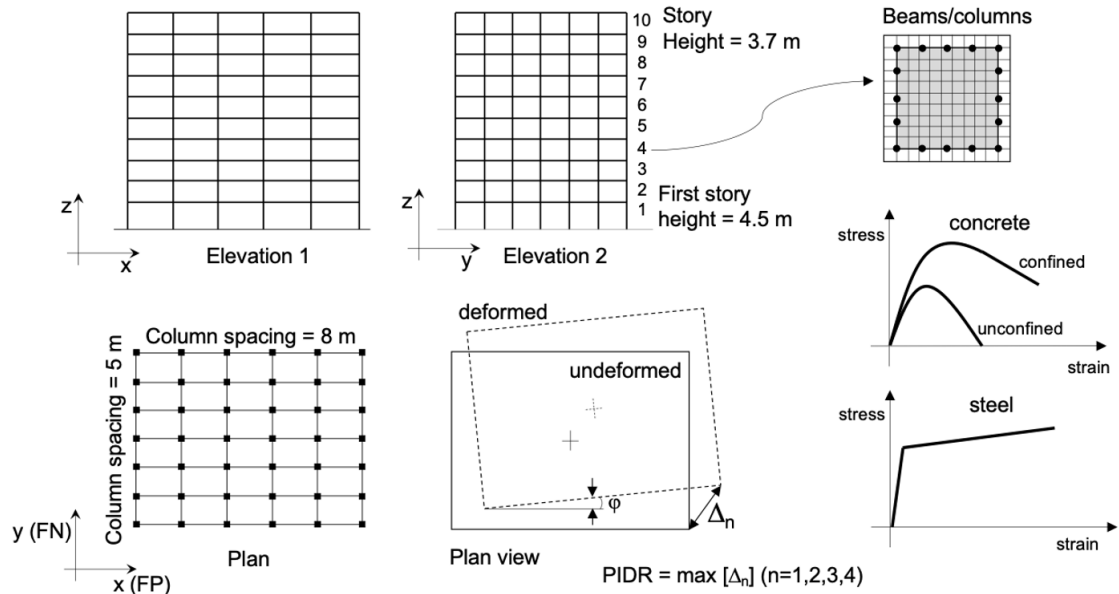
Three-dimensional reinforced concrete 10-story building model. (A) Elevation view along the two principal directions, X and Y; (B) Plan view with a schematic of the building deformed shape; (C) Detail of the fiber section model adopted (beams and columns) and materials constitutive laws (steel and concrete).
